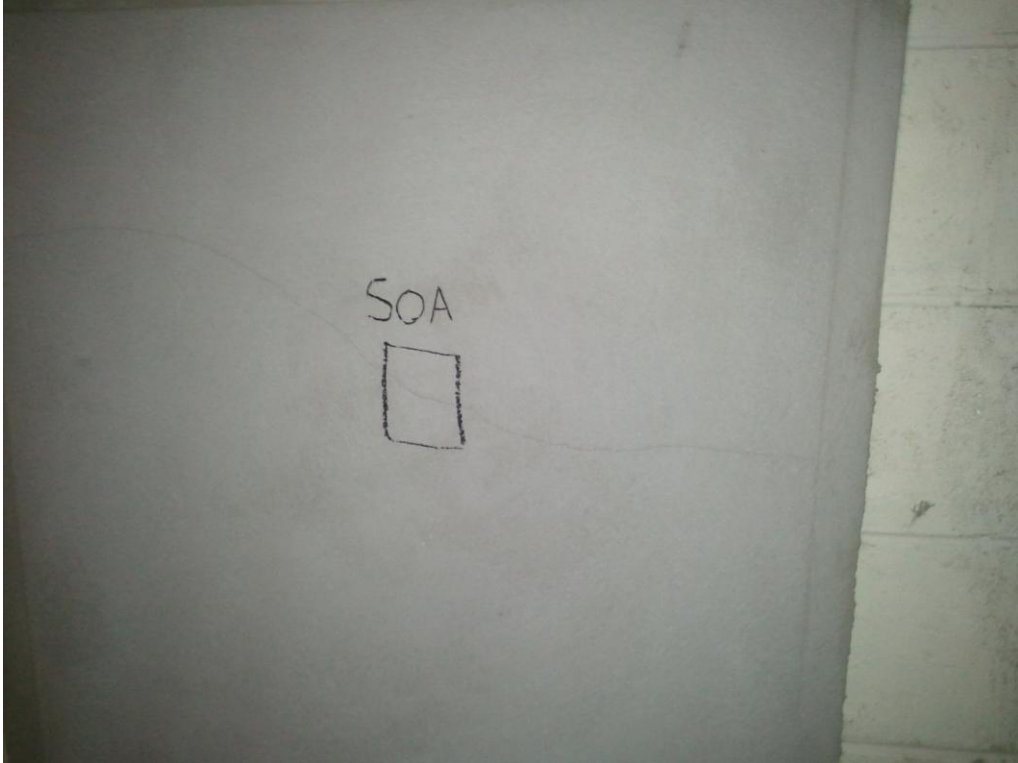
Basement Level – Sample Location 50A (Small Crack in Concrete Shielding)
